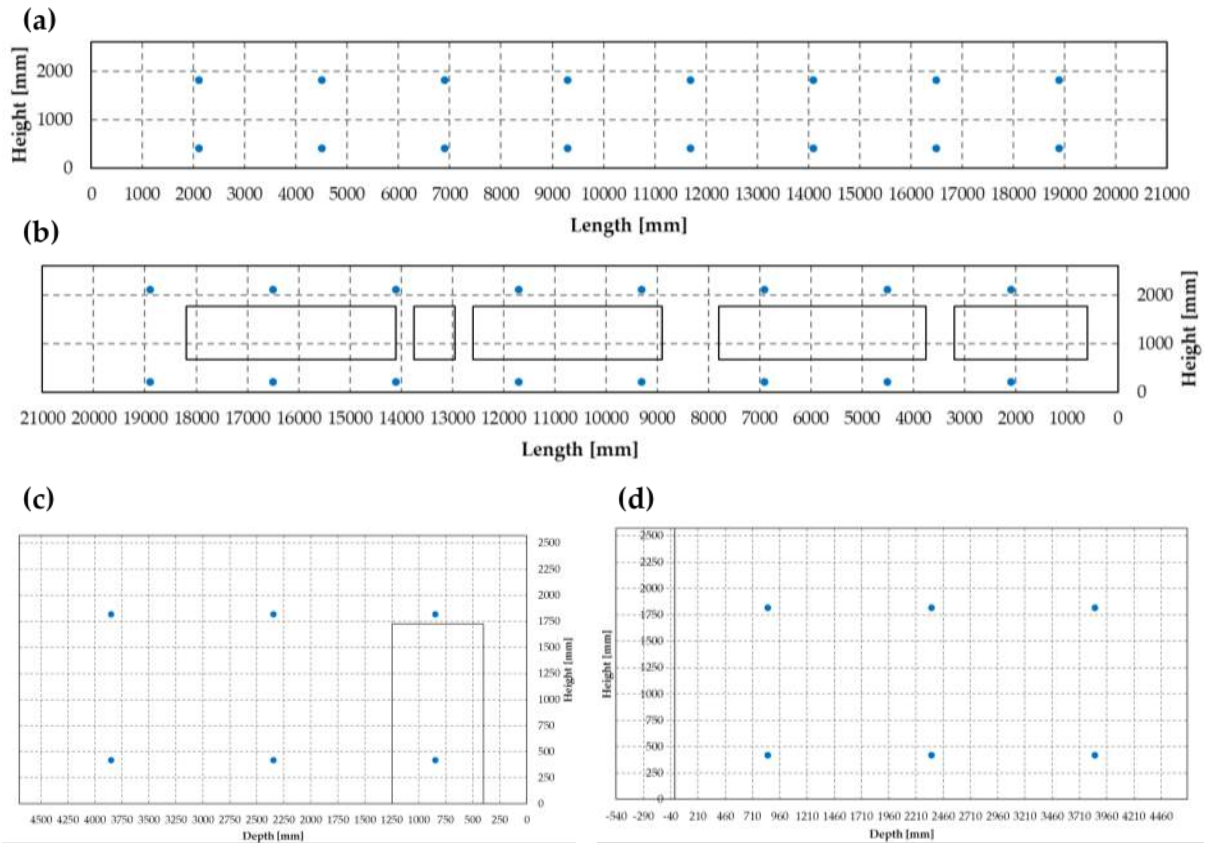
Diagram showing TSC locations as viewed from the inside of the room on (a) back wall, (b) front wall, and (c) left-end wall and (d) right-end wall.
